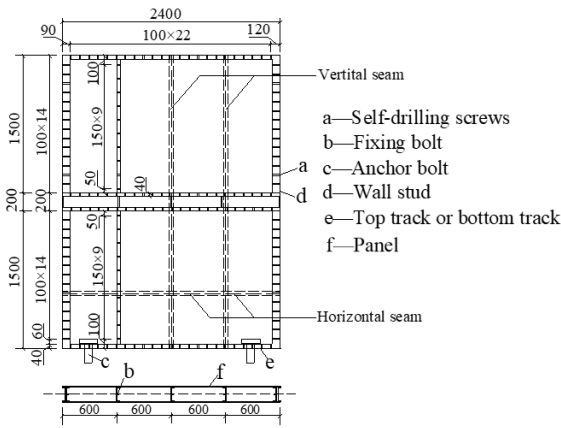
The composite cold-formed thin-wall steel two-story exterior wall
